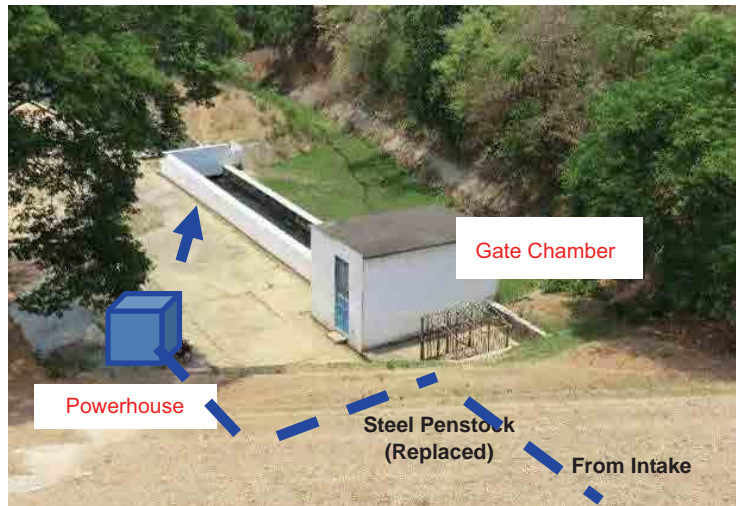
Conceptual Arrangement of Hydroelectric Power Plant at North Nawin Dam. Source: the Survey Team (2013)
